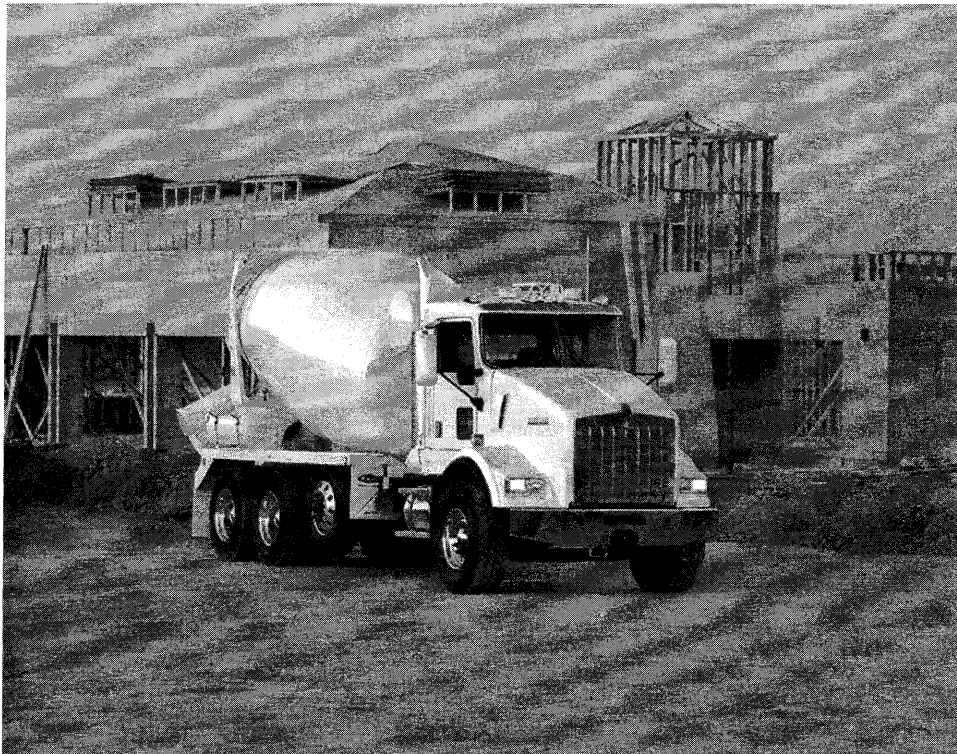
Truck mixer. (Courtesy of Kenworth Truck Company)
